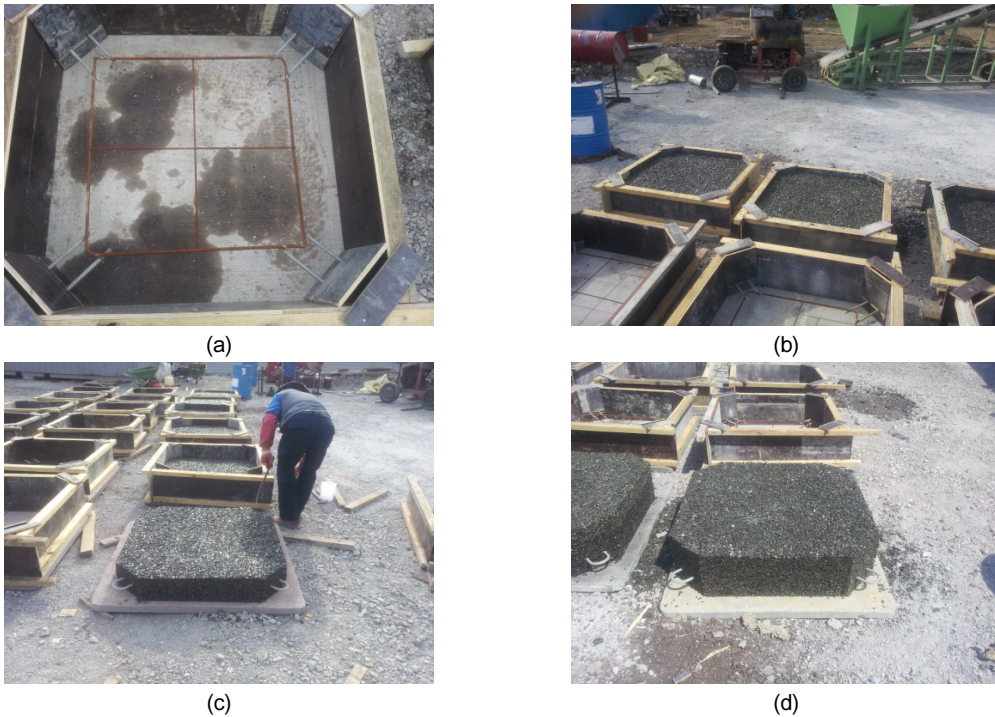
Photographs showing the revetment block making process. Making forms (a), curing (b), removal of forms (c) and the finished block (d).
